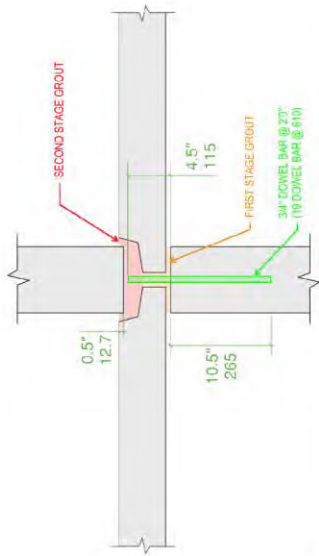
Typical load-bearing wall panel to slab panel connection detail. (dowel terminates within slab depth). This detail occurs in the majority of the wall panels.
